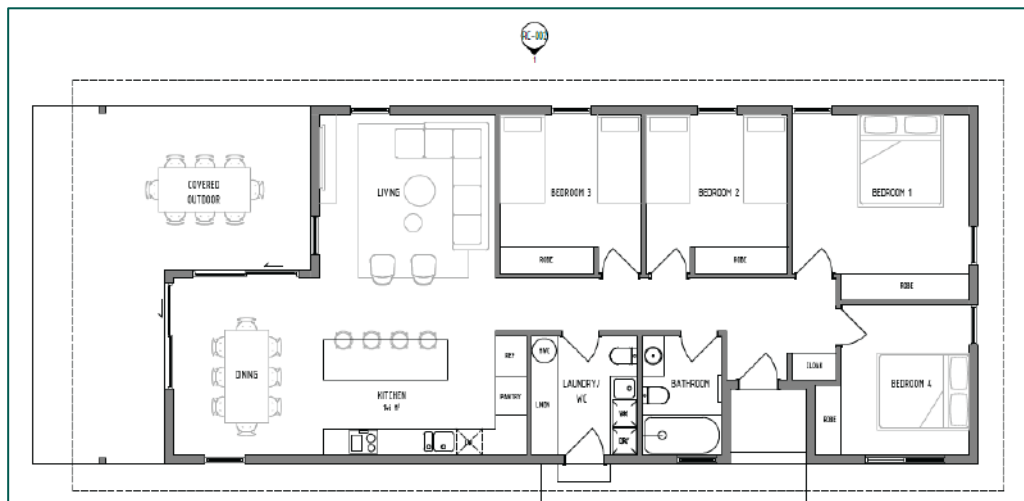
Whānau Kainga – Four-Bedroom Floor Plan. Source: ĀKAU.
